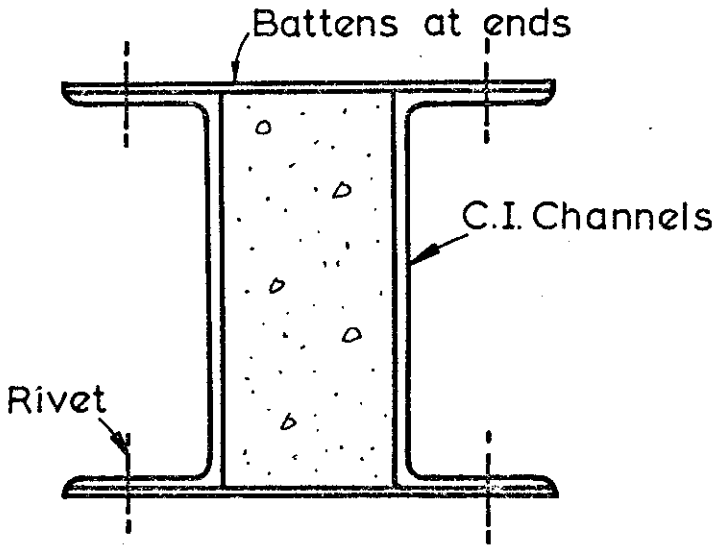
CROSS SECTIONS OF TEST COLUMNS.
